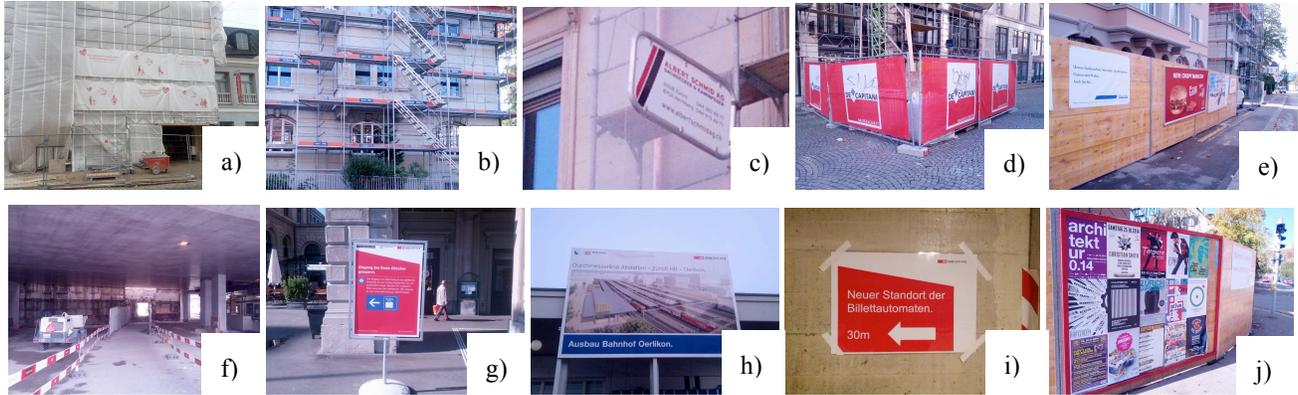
Types of displays. From left to right: building façade, plank ads and posters on construction frame, ground level fence from canvas, wood, and planks, small and big poster stands, standalone poster, and public notice area.
